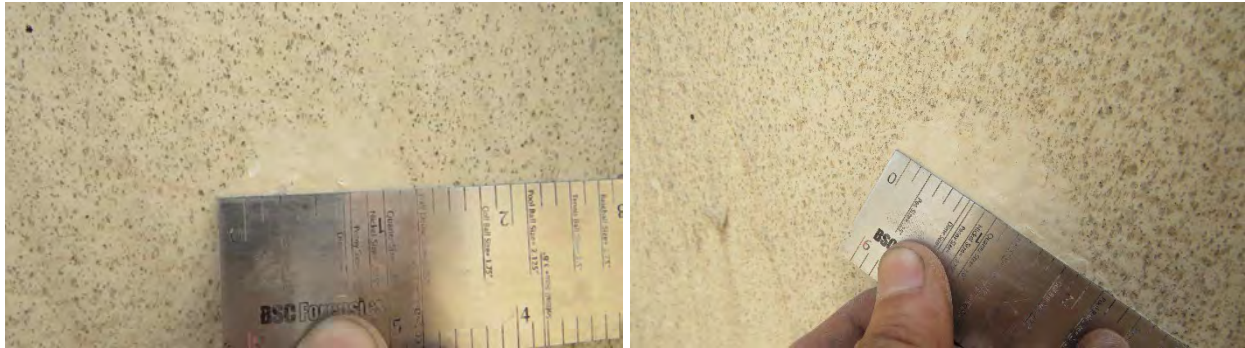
Roofing on the bob burns hall (1) with no hail damage.
